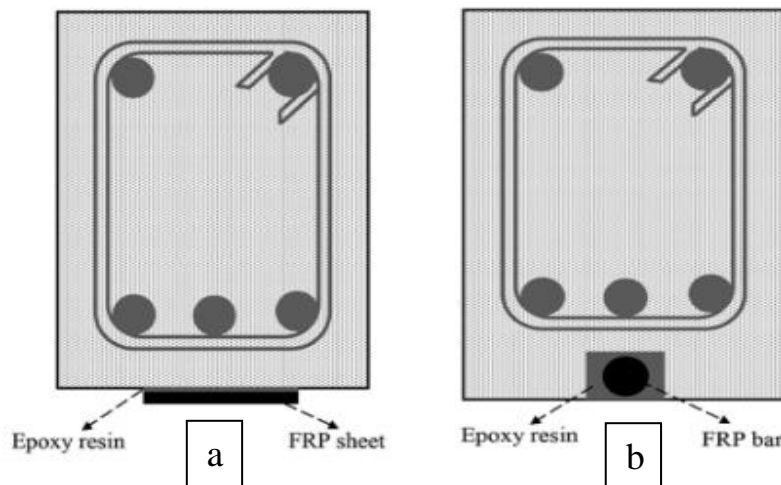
Strengthening reinforced concrete beam with FRP [3]
